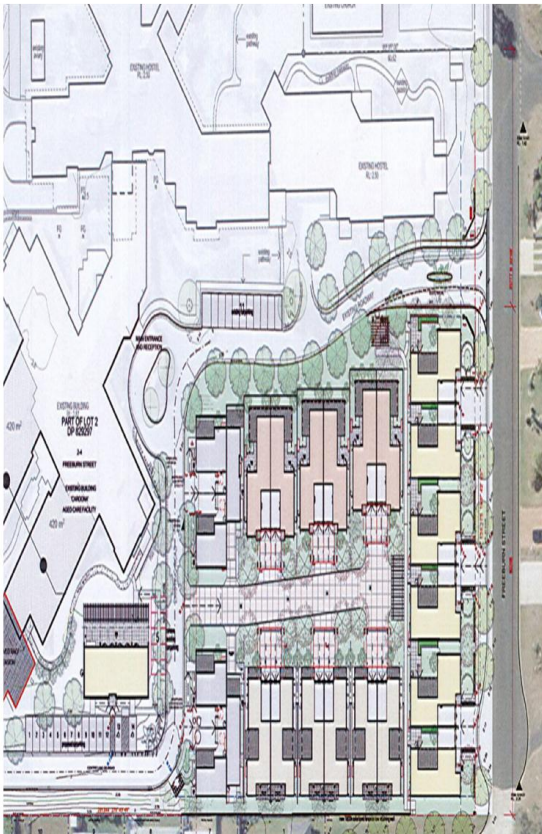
shows the proposed layout submitted with DA2018/0445 (now withdrawn at the applicant's request)
